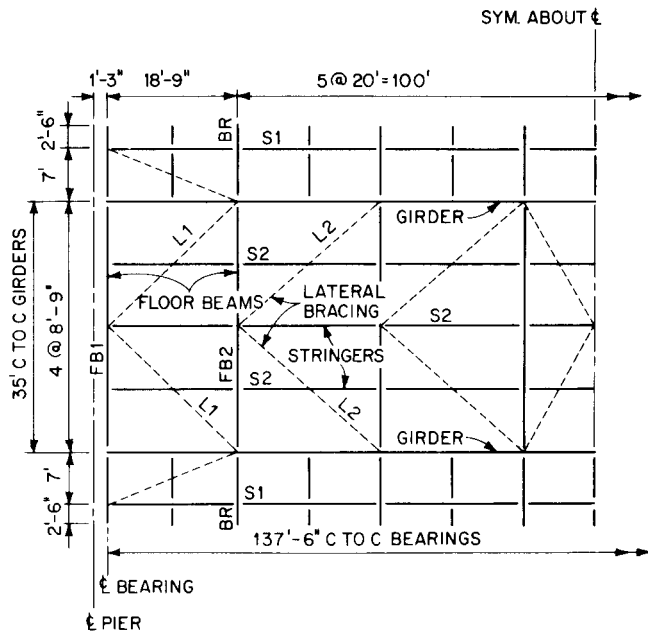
Framing plan for four-lane highway bridge with deck plate girders.
